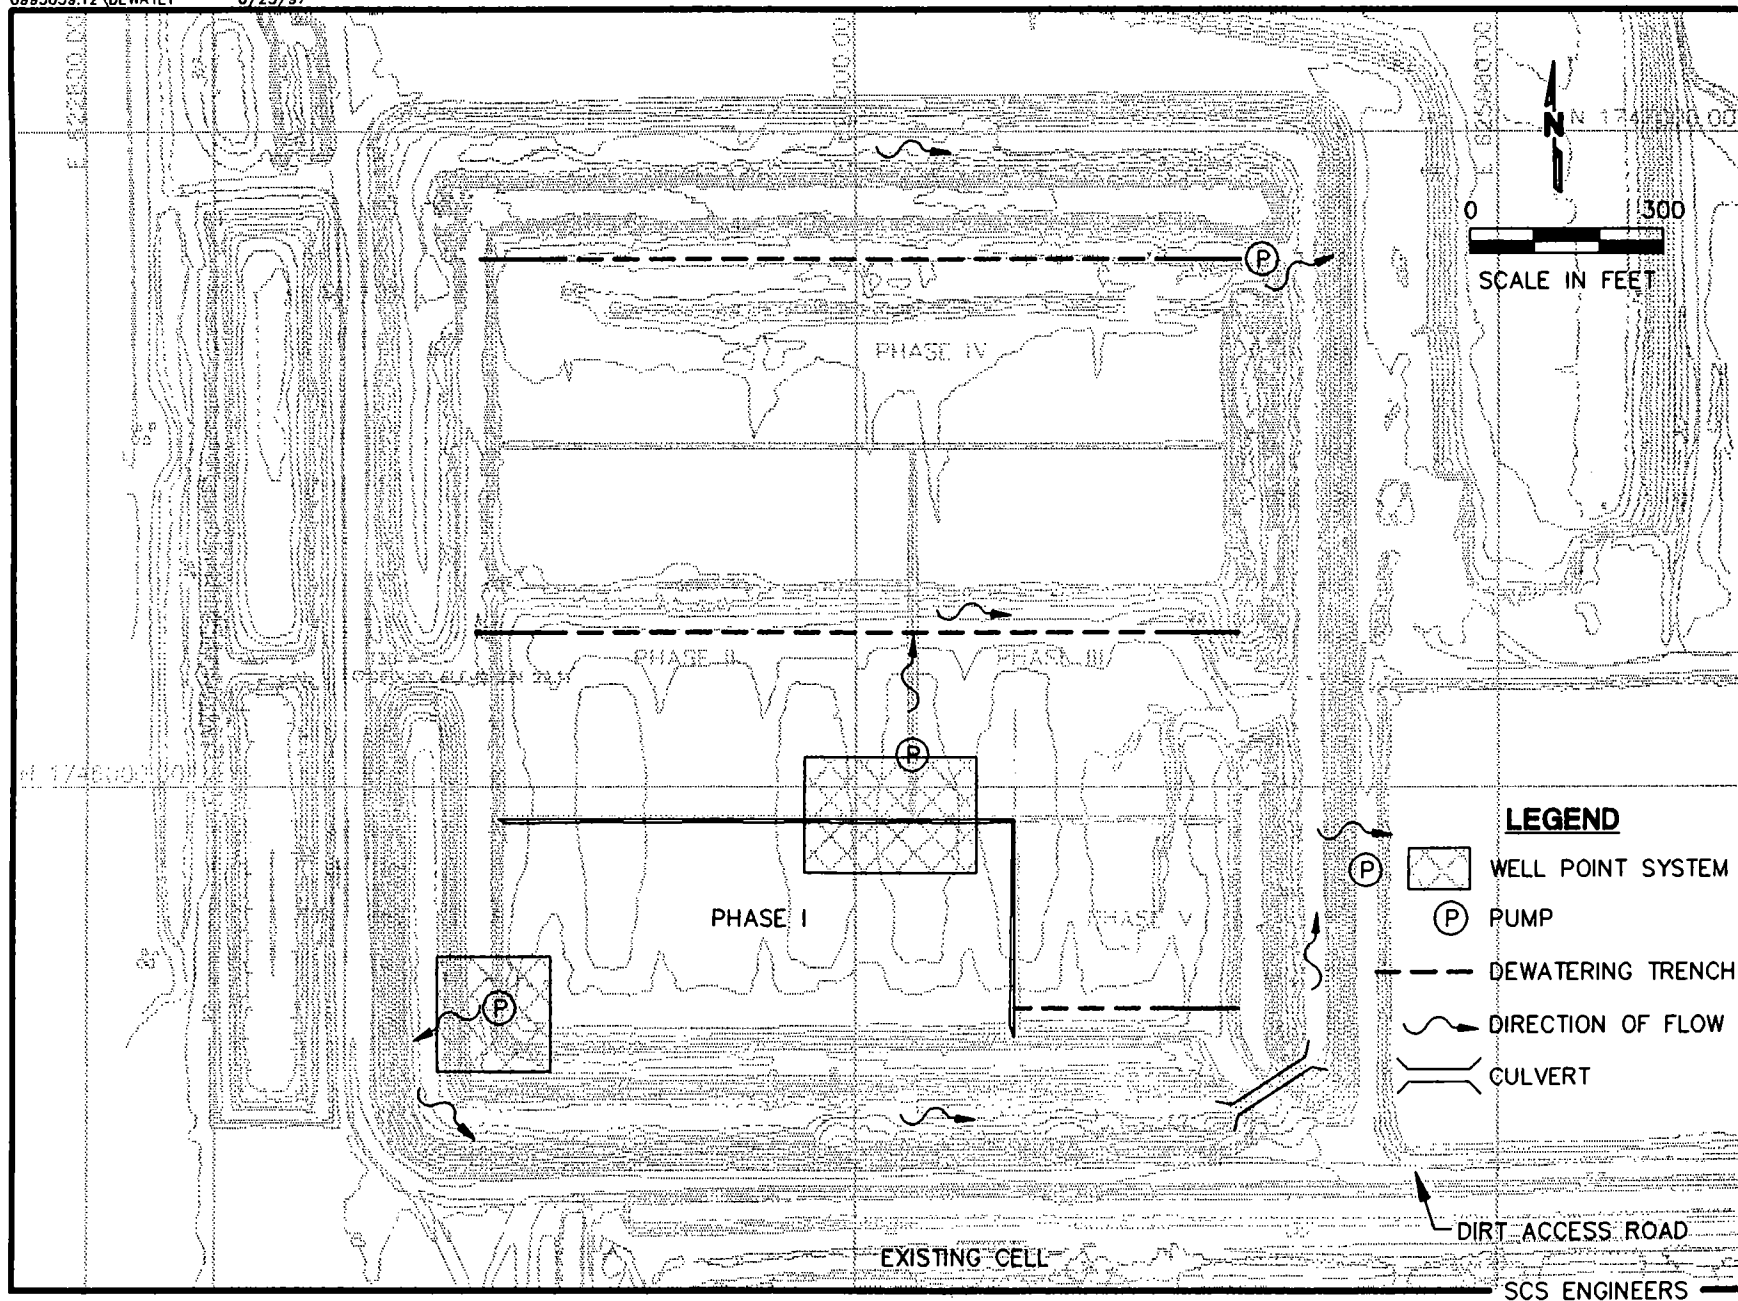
Step II Dewatering Plan (Site Conditions On 12/10/96).
